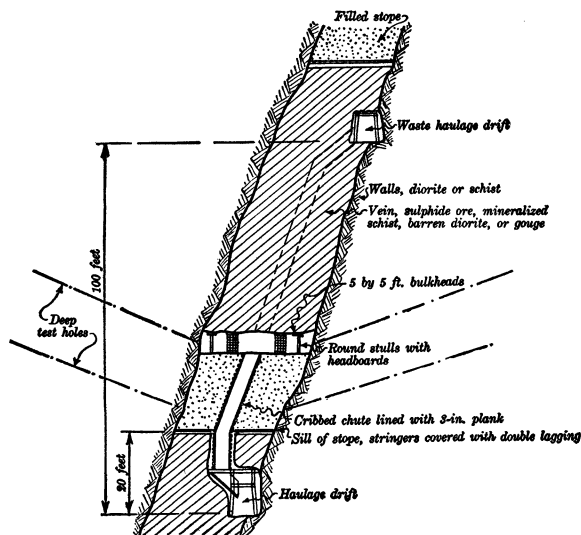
Section across vein through cut-and-fill stope, Pecos mine, New Mexico.
